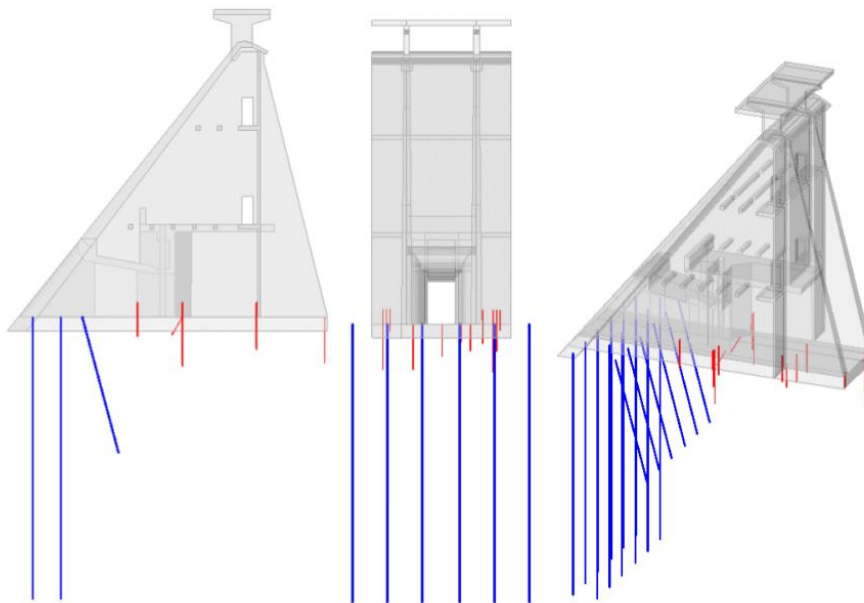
Grout curtain at dam A, shown as *blue lines*, and locationn of piezometers, shown as *red lines*. Left: Section with the upstream side to the left. Middle: Front view of the midsection. Right: 3D illustration of the grout curtain and the dam section.
